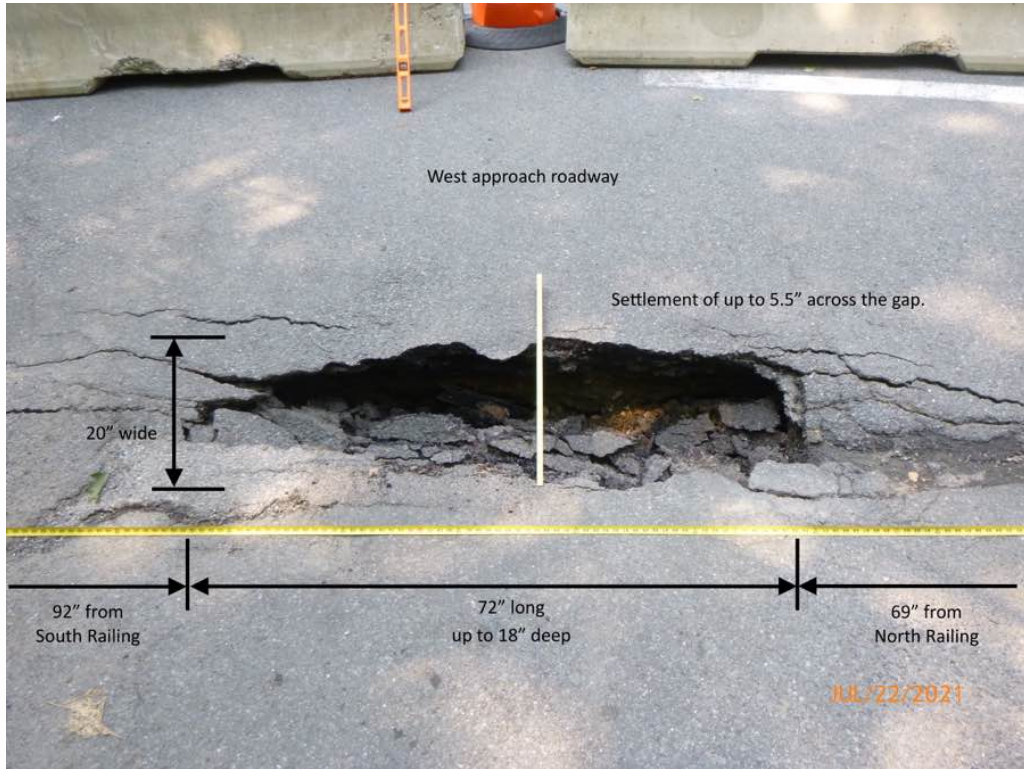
Approach has a large hole in the west approach pavement at the west deck end.
